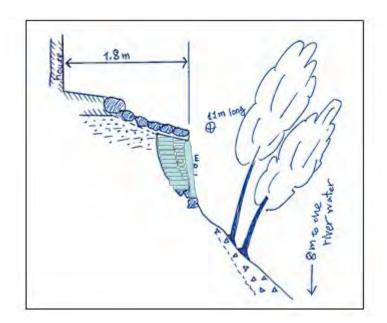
Slope failure at Long Mountain (Form a platform and utilize stones and a concrete retaining wall) (Source: JET)
